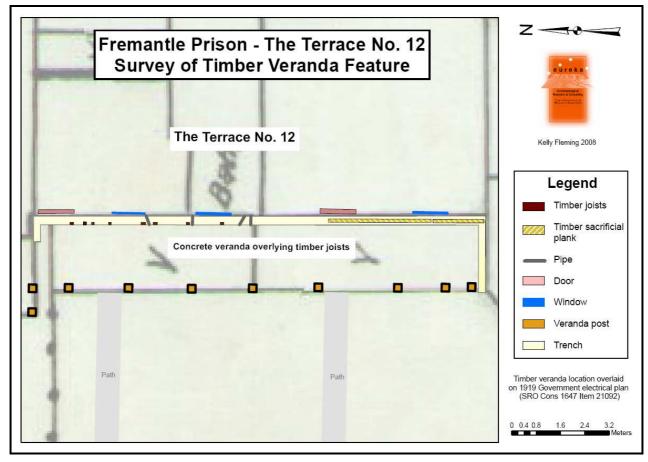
Plan showing location of timber features No. 12 The Terrace veranda
